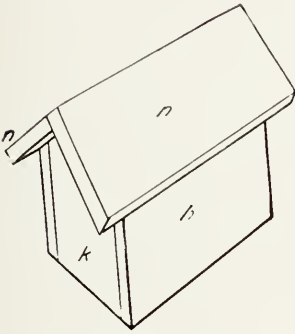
House ready to place over floor and posts as shown in figure 14.
